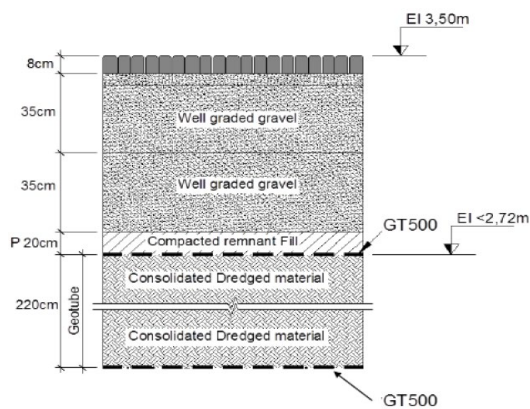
Sketch. Pavement design (Stephens & Melo, 2013).
